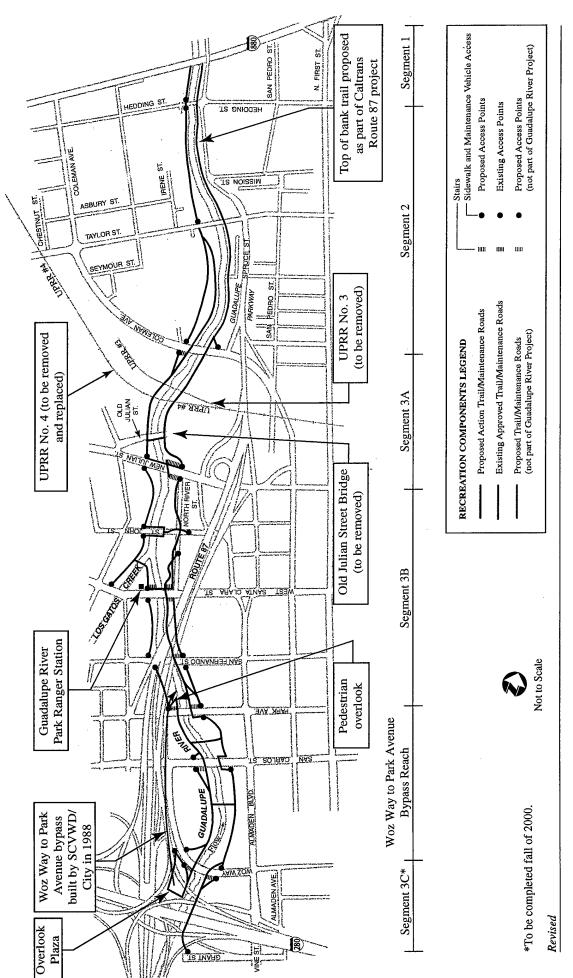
Existing and Proposed Recreation Components under the Bypass System Alternative
